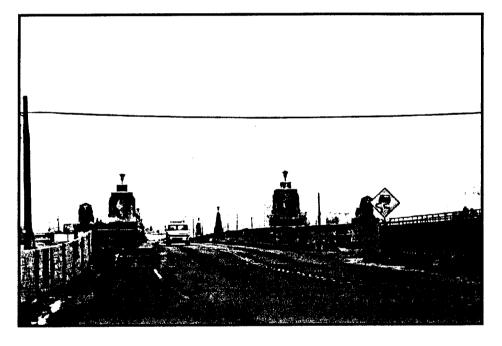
View northwest of Seventh Street Bridge with SPRR Bridge to right.
